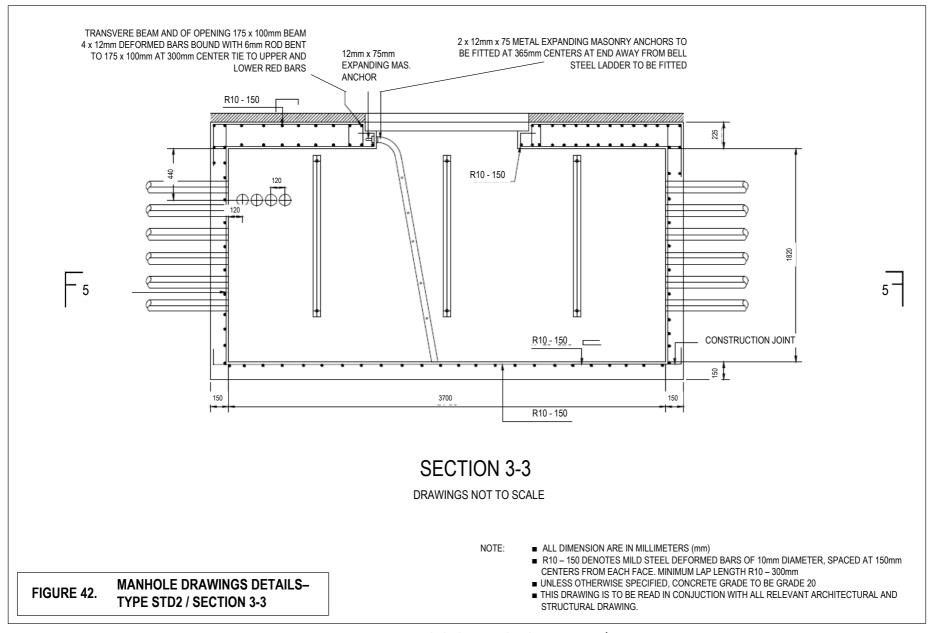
Manhole drawings details - Type STD2 / section 3-3
